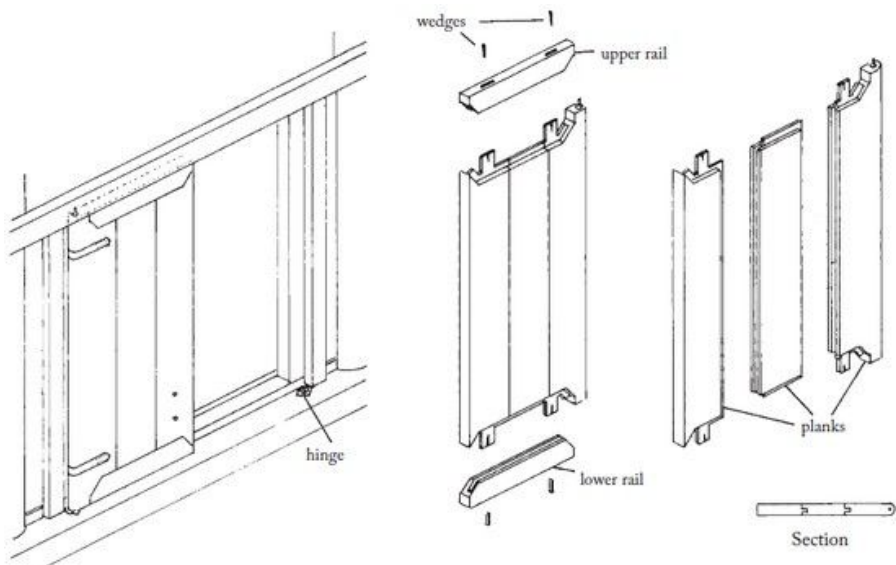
Door assembly. Each door is fabricated from three solid planks, locked together by upper and lower rails.
